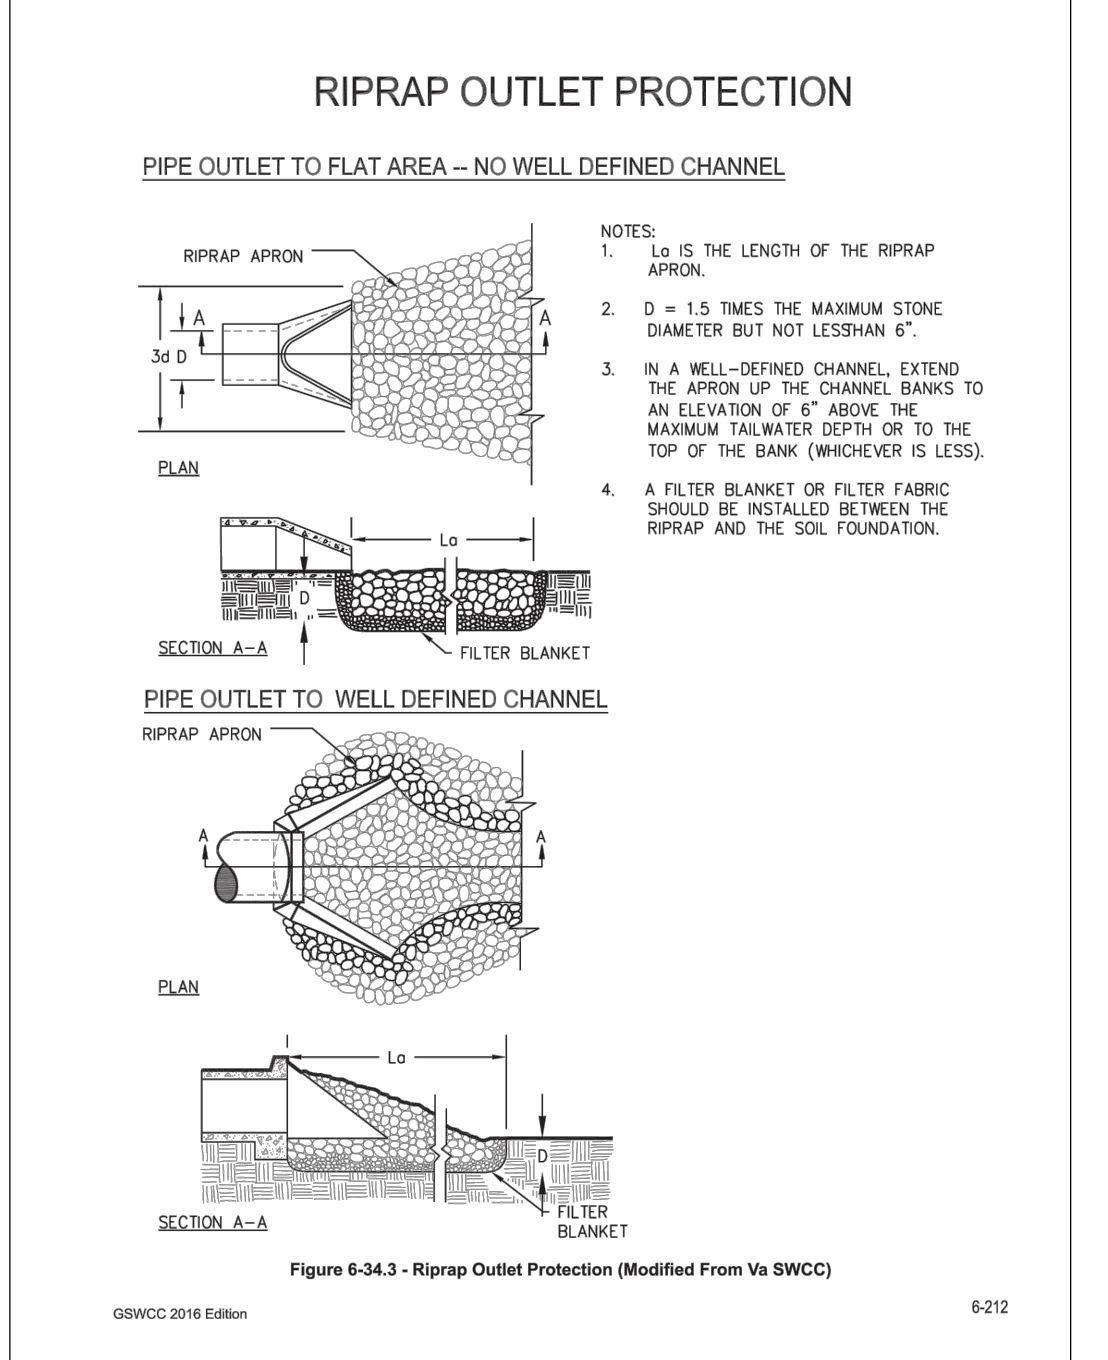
Riprap Outlet Protection (Modified From VA SWCC)
